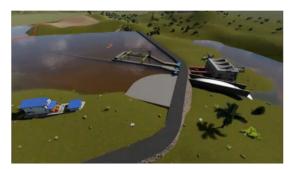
Illustration of Pond Structure Plan and Additional Guide Wall at Sengguruh Hydropower Intake Area
